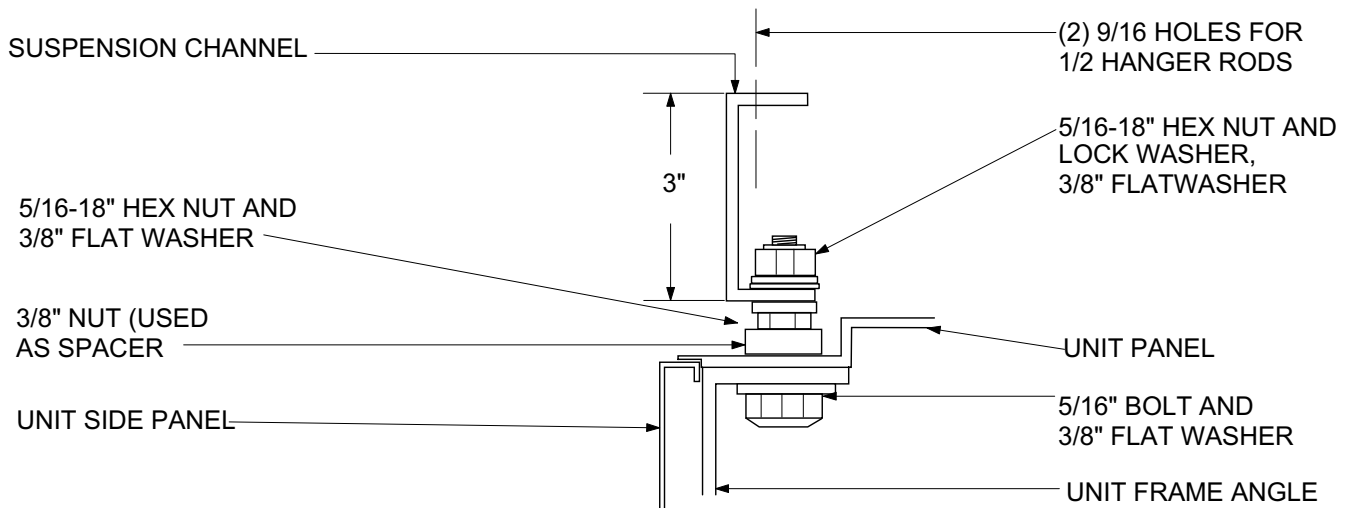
TYPICAL SUSPENSION CHANNEL MOUNTING
